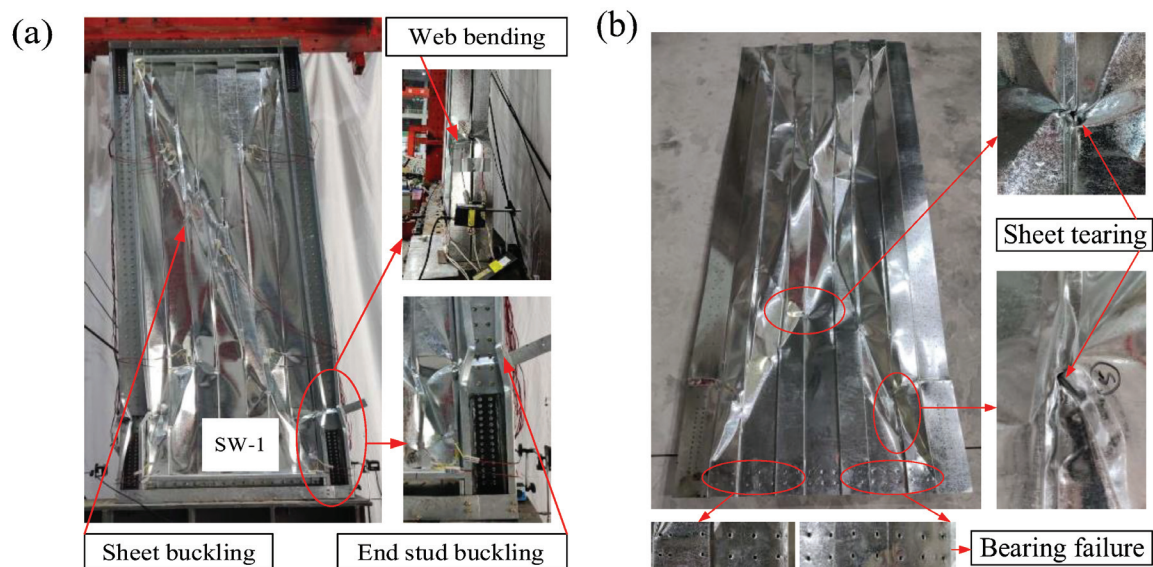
Failure modes of SW-1: (a) specimen SW-1; (b) corrugated steel sheet.
